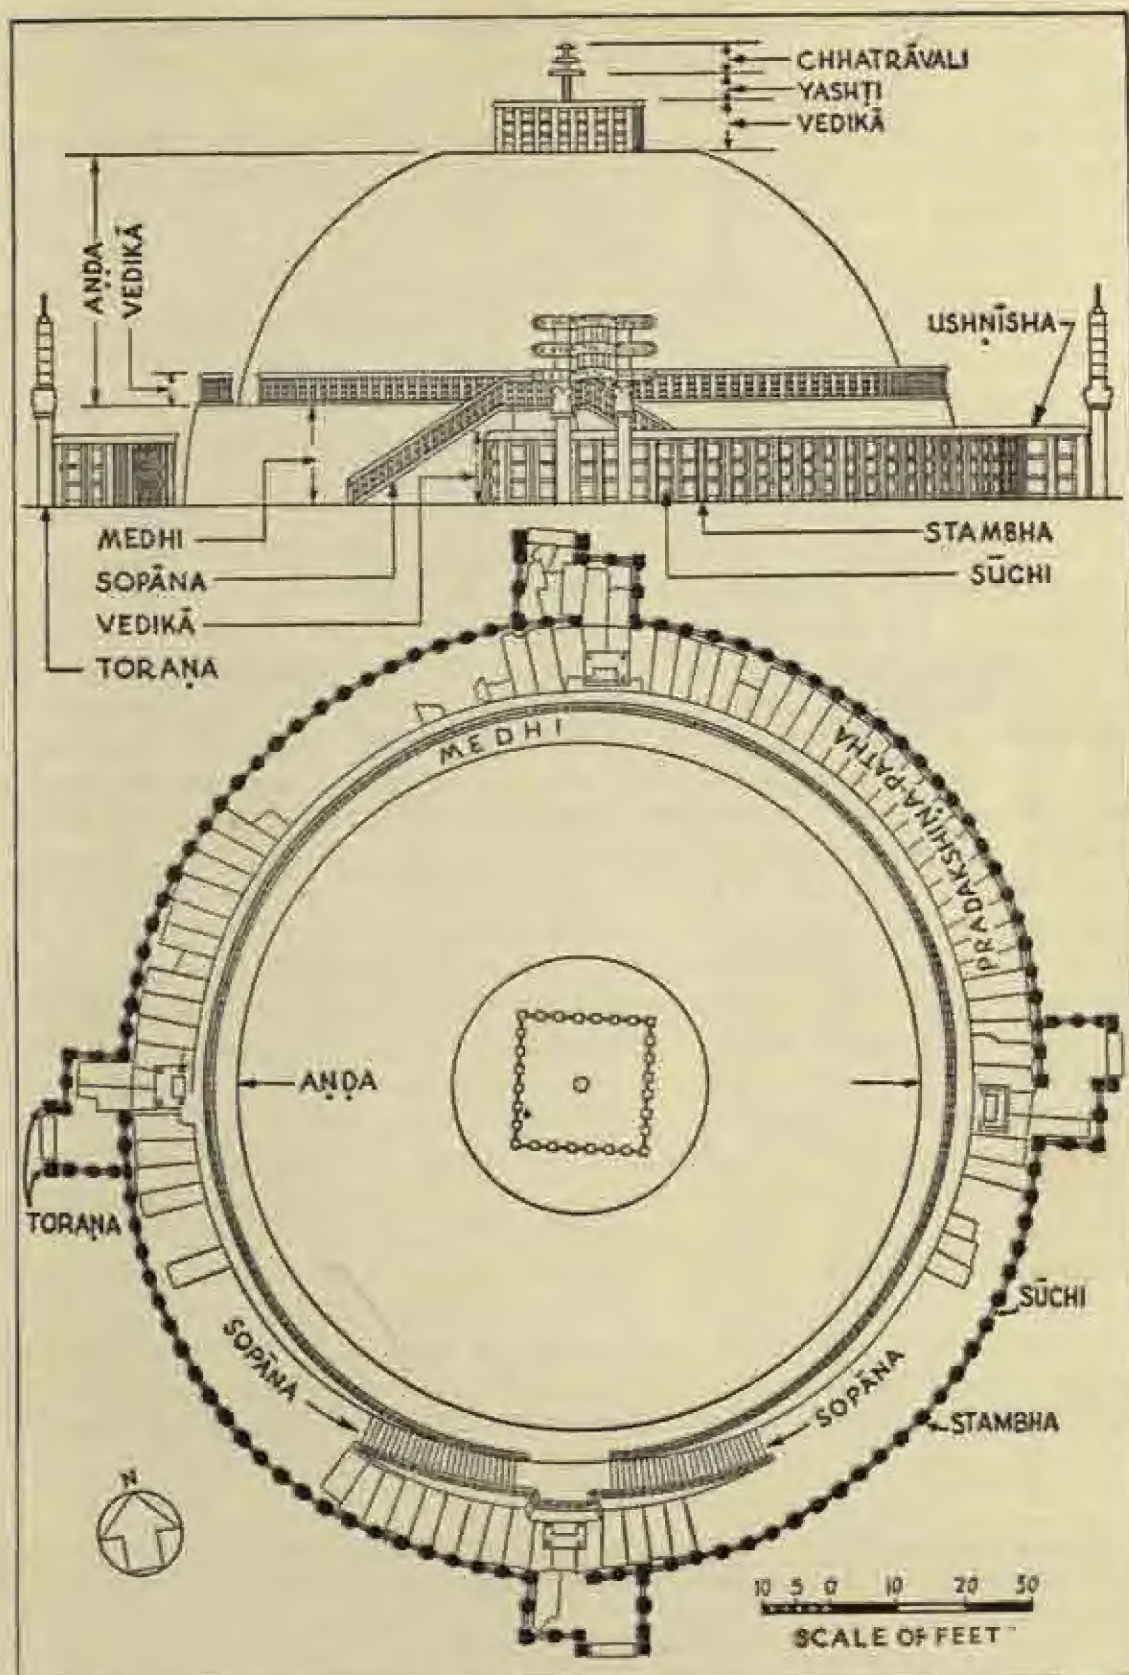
Sanchi: Stūpa 1, plan and elevation
